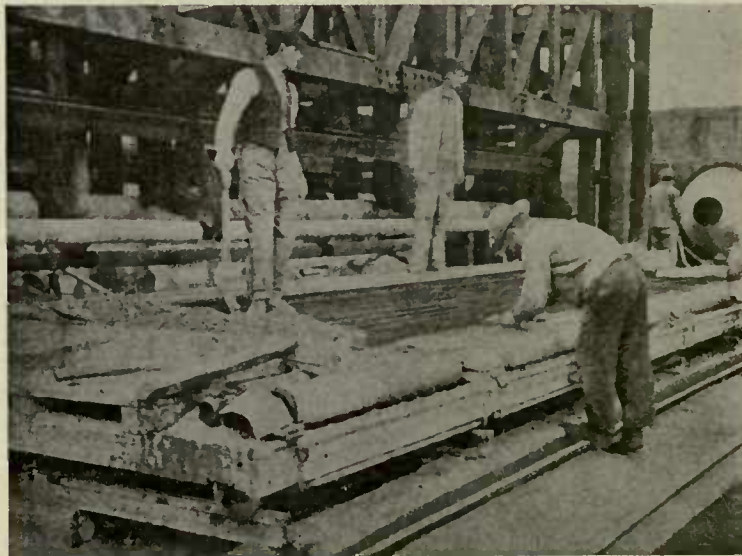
ROLLED CONCRETE PILING BEING MADE.
